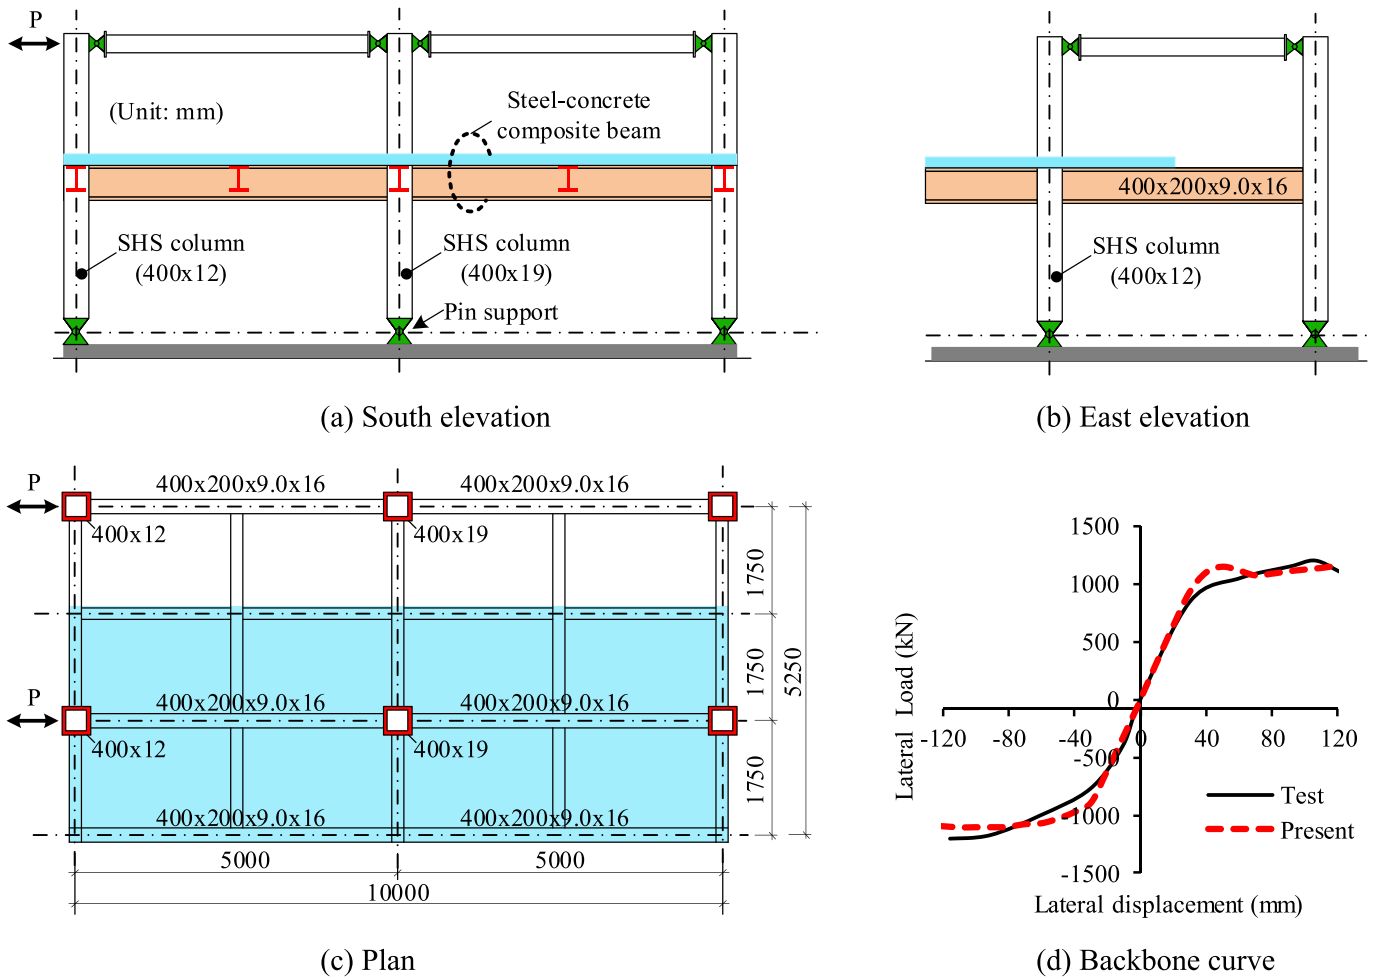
Spatial frame with steel column and steel-concrete composite beams [37].
